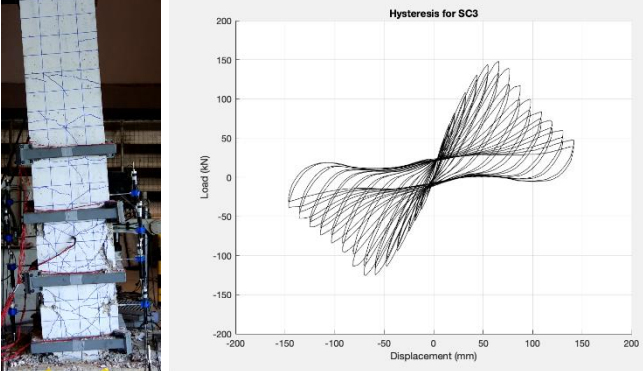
Flexural joint failure of strengthening lap-splice column SC3
